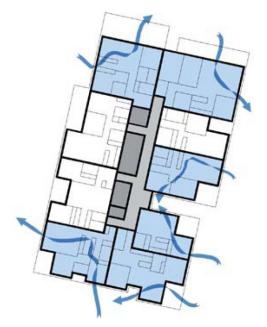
Cross ventilation of typical Building 1C floor plate Source: *Bates Smart
